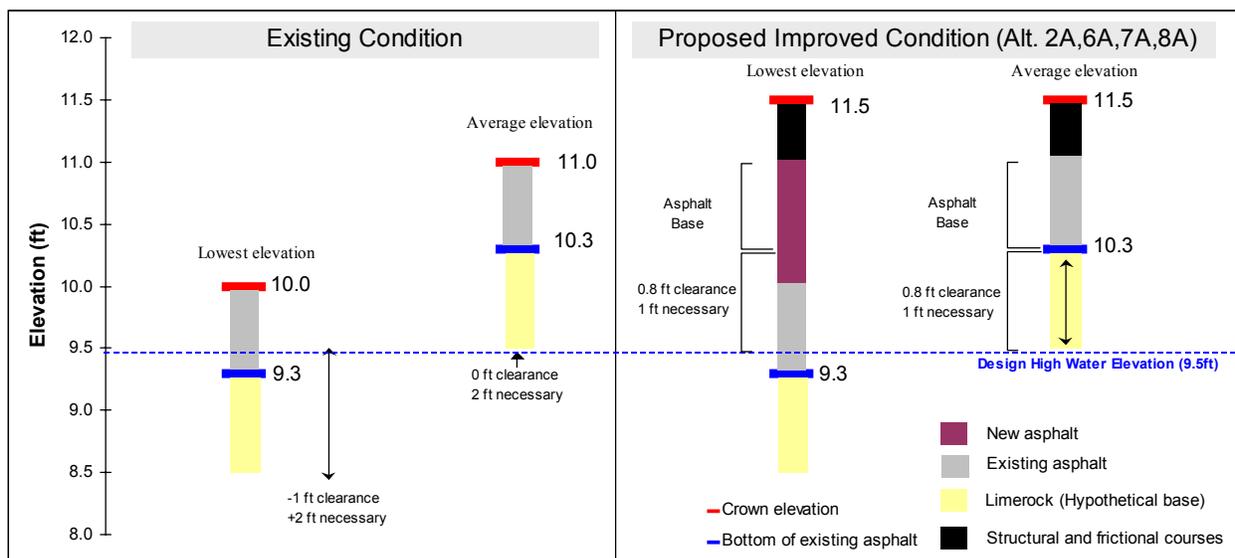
Existing and proposed improved roadbed compositions and elevations.
